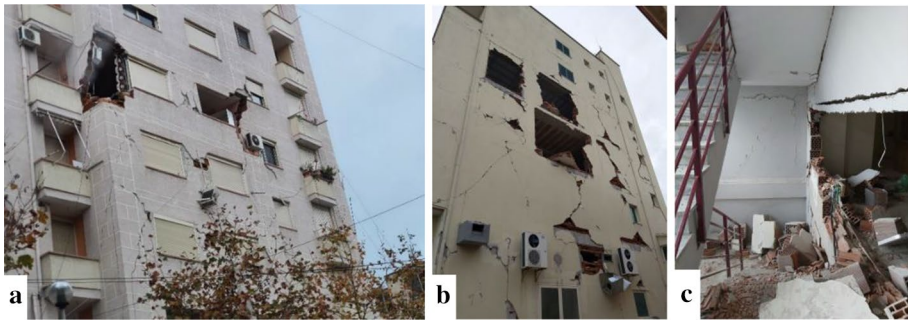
Residential buildings in Durres (Grade 3). a Slight diagonal cracks and failure in the external facade; b Severe diagonal cracks and partial failure in the external facade wall; c failure in infill walls
